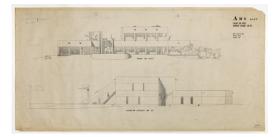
Southwest Elevation and Southeast Elevation (13 February 1953)²⁹
